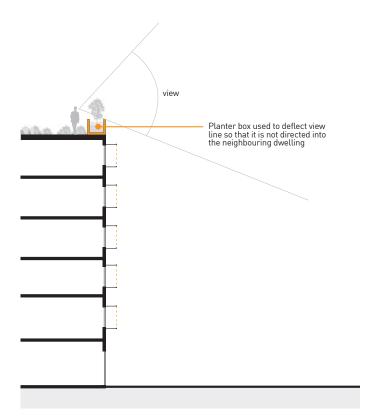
B.9-3: Incorporation of planter boxes into walls or ballustrades of roof terraces
